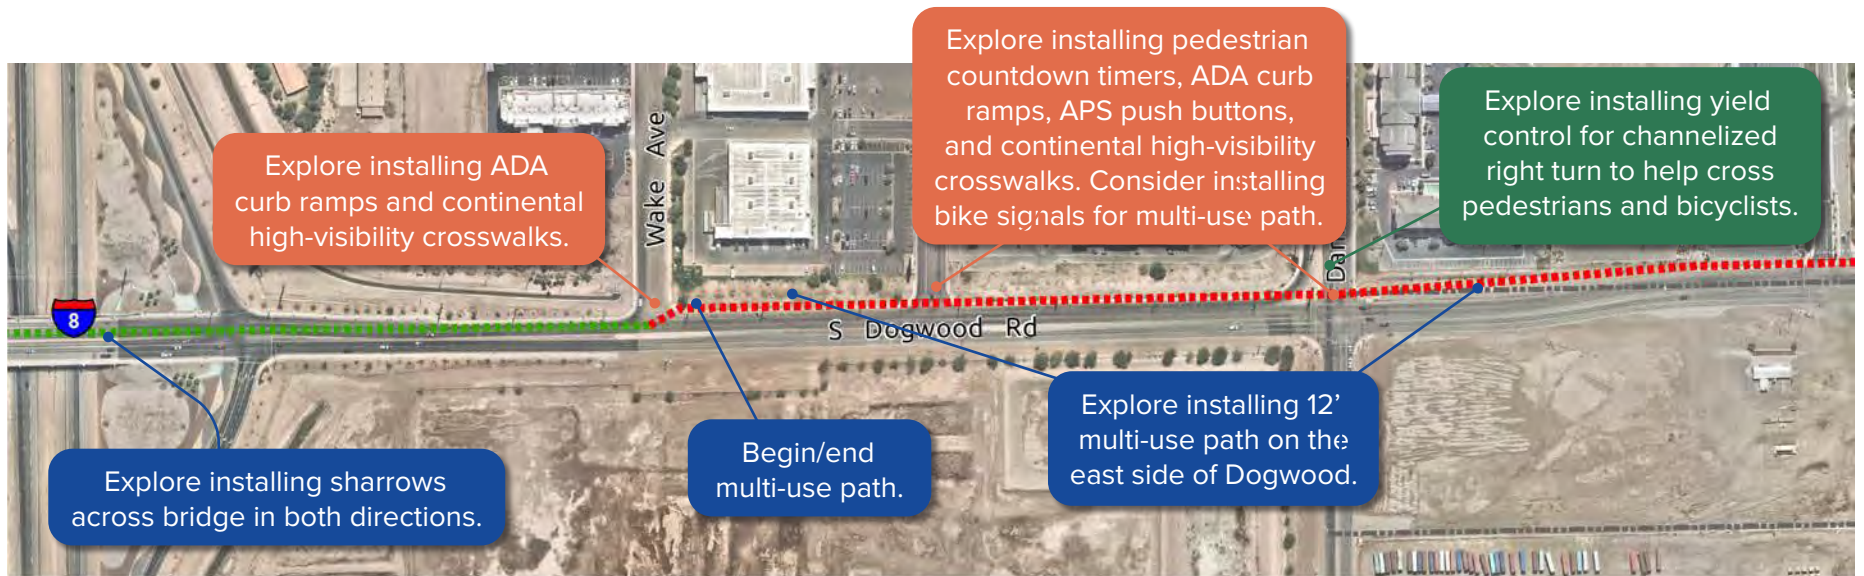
Dogwood Road - Birch Street Proposed Improvements
